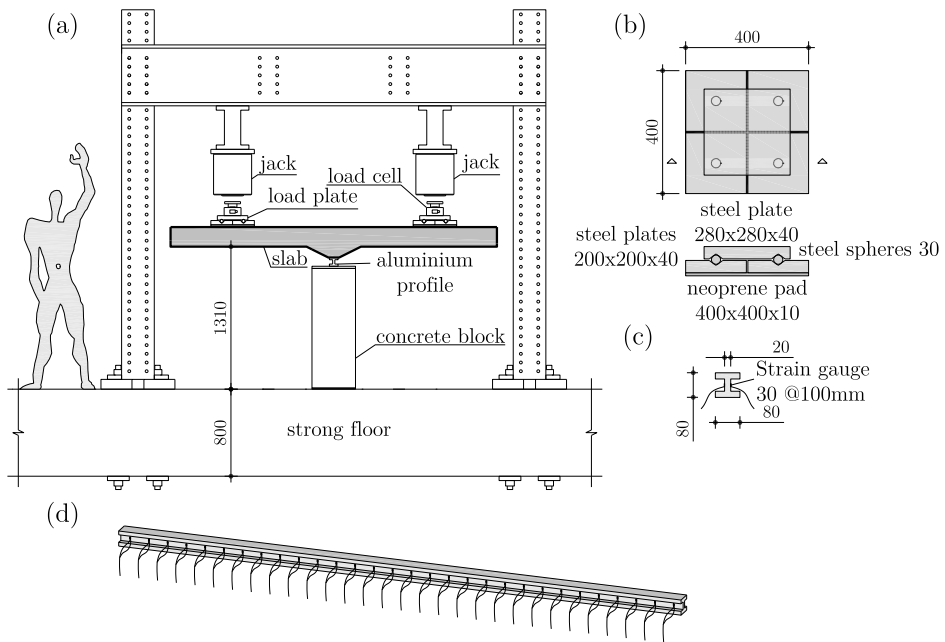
Test setup (dimensions in [mm]): (a) view; (b) loading plates; (c) cross-section; and (d) 3-d view of aluminium profile
